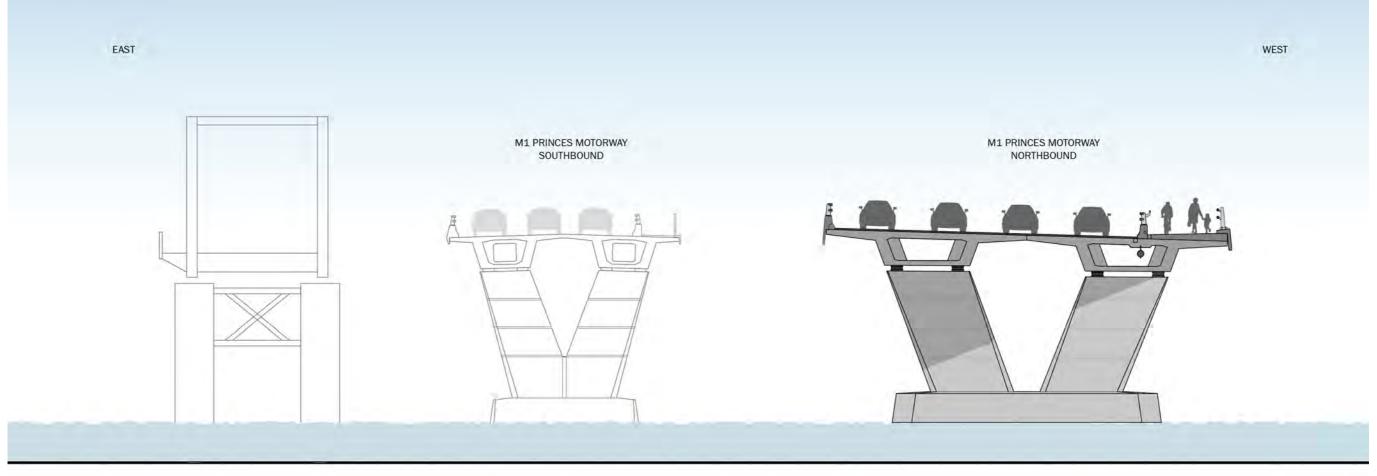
Section through bridge over Shoalhaven River - Incrementally Launched Option (Preferred) Note: Subject to further design development and consultation.
